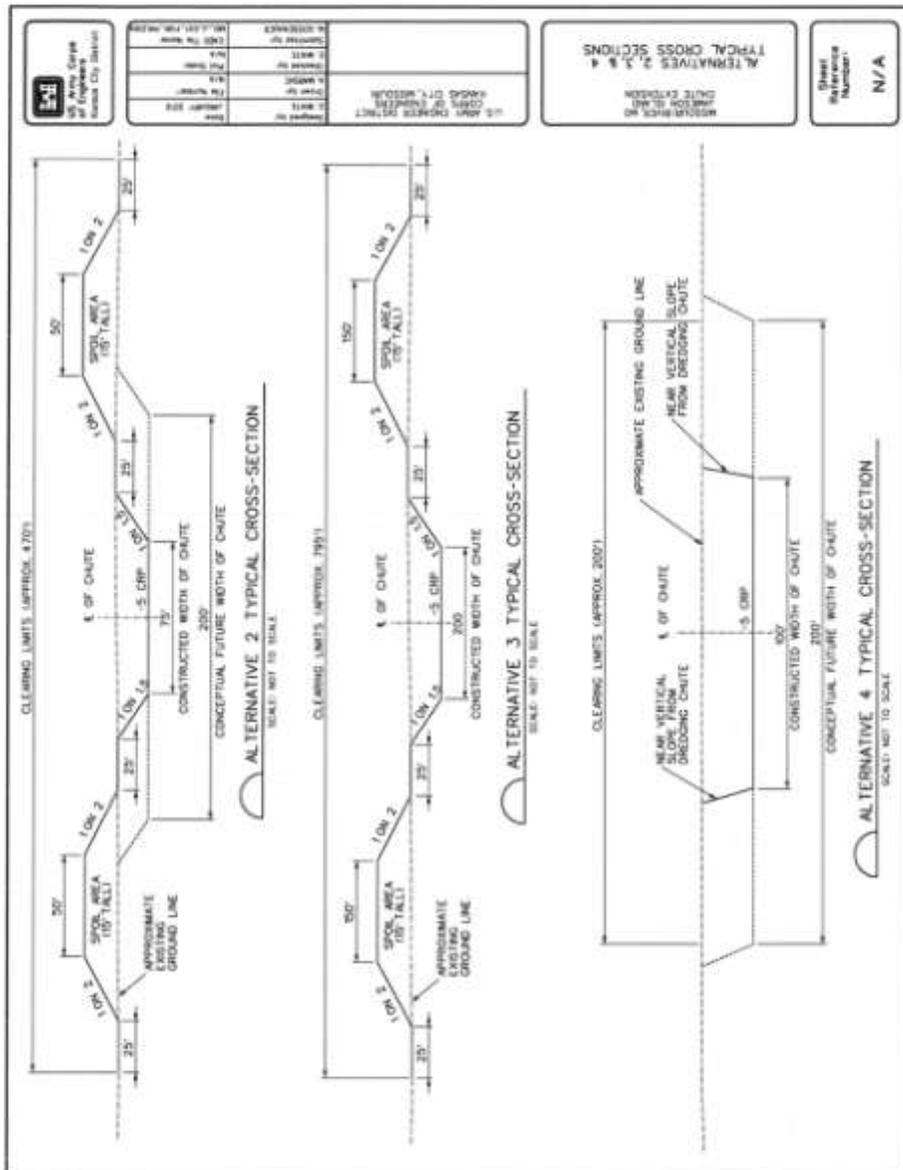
Typical Chute Cross Sections (Alternative 2, 3 & 4)
